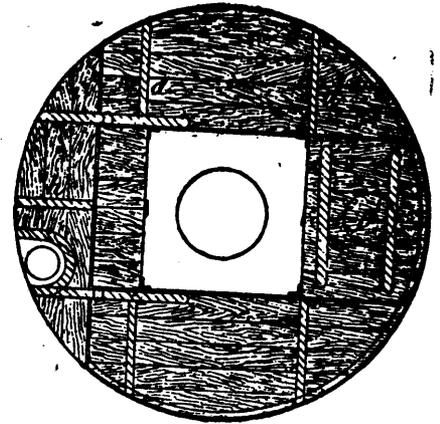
Walling. Scale, 1/8 in. = 1 ft.
